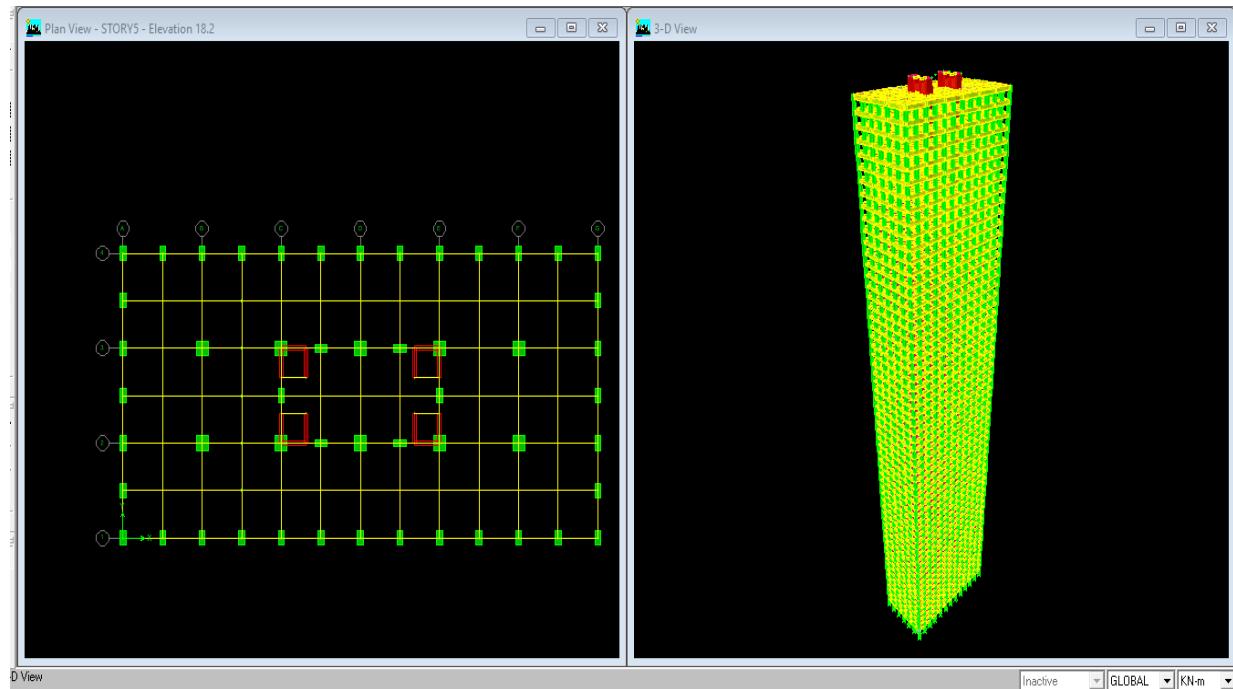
Plan view and 3-D view of 60 storied Tube-in-Tube structure building
